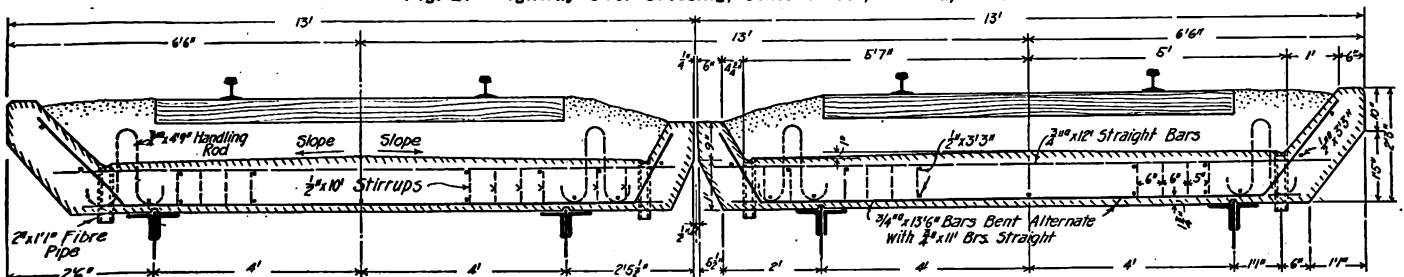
Standard Concrete Deck for Double Track on Plate Girders, C., M. & St. P. Ry.
